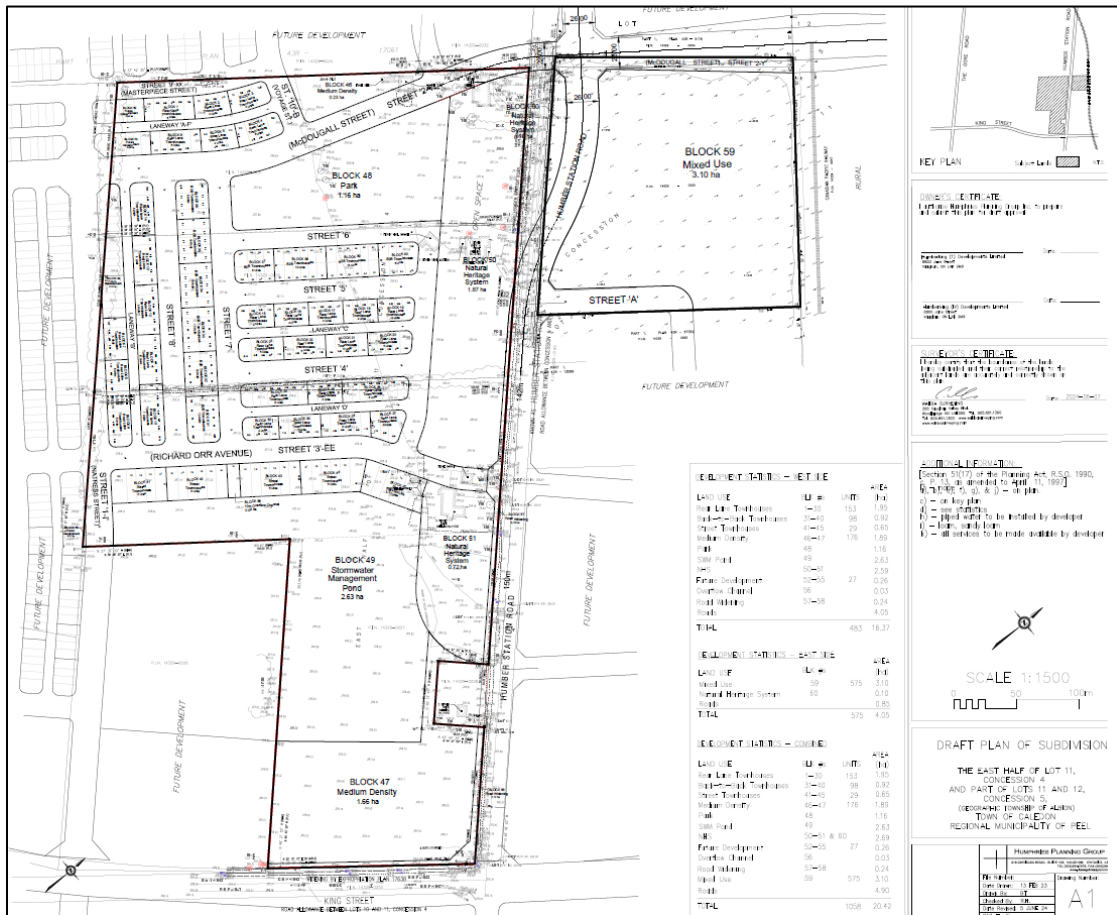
PROPOSED DRAFT PLAN OF SUBDIVISION (WEST)
